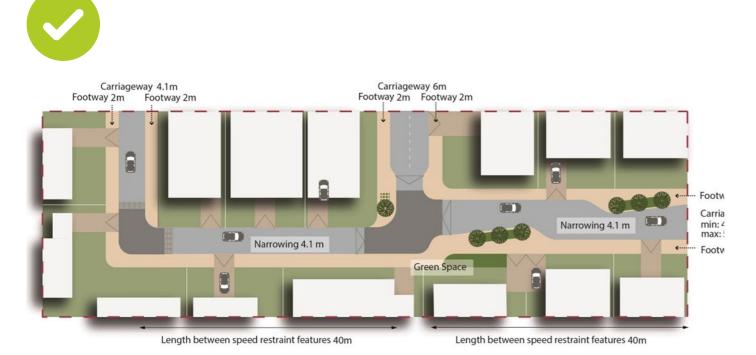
Street Typology Plan for a Residential Link Street in a Rural Context
